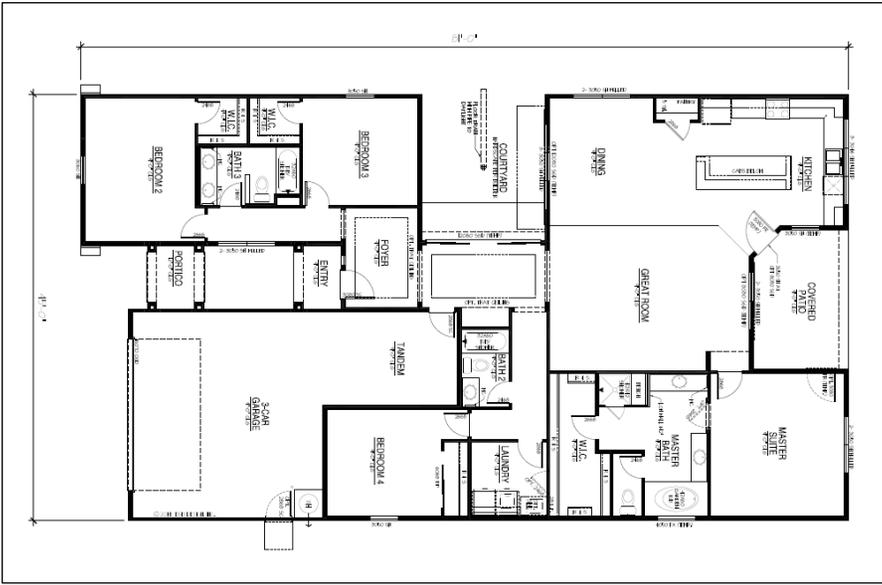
Exhibit A – Housing Product, The Seven Plans with Three Elevations (Spanish Colonial, Ranch Territorial, and Craftsman)
